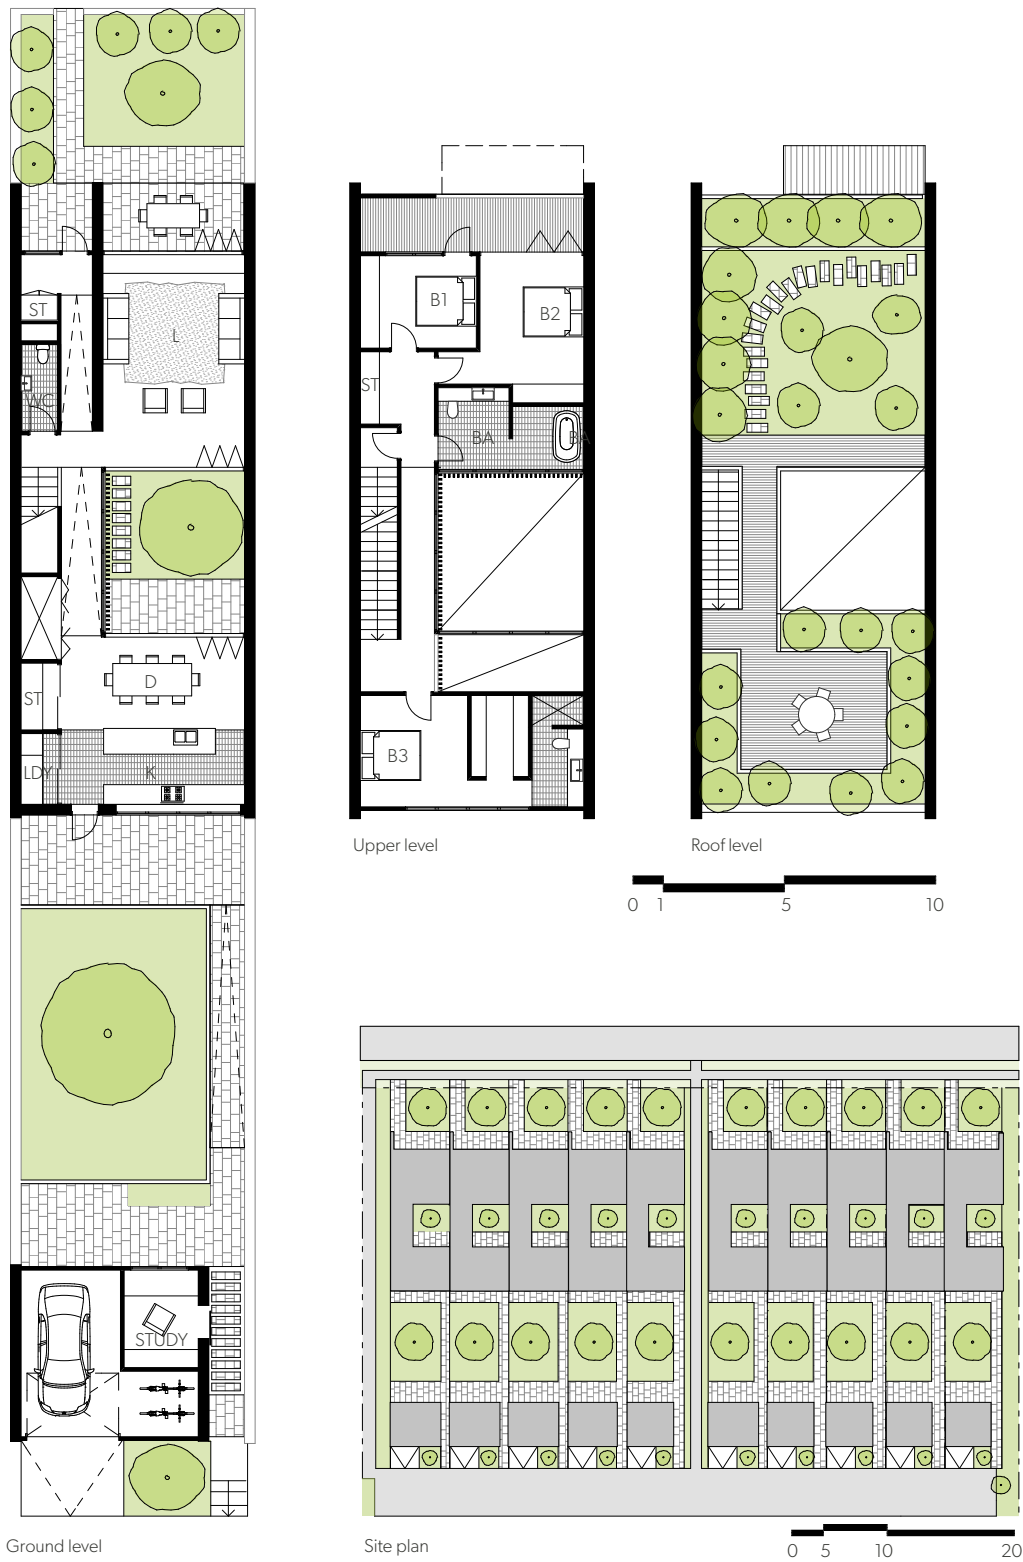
Sample detail plan of terraces car parking accessed from rear lane
